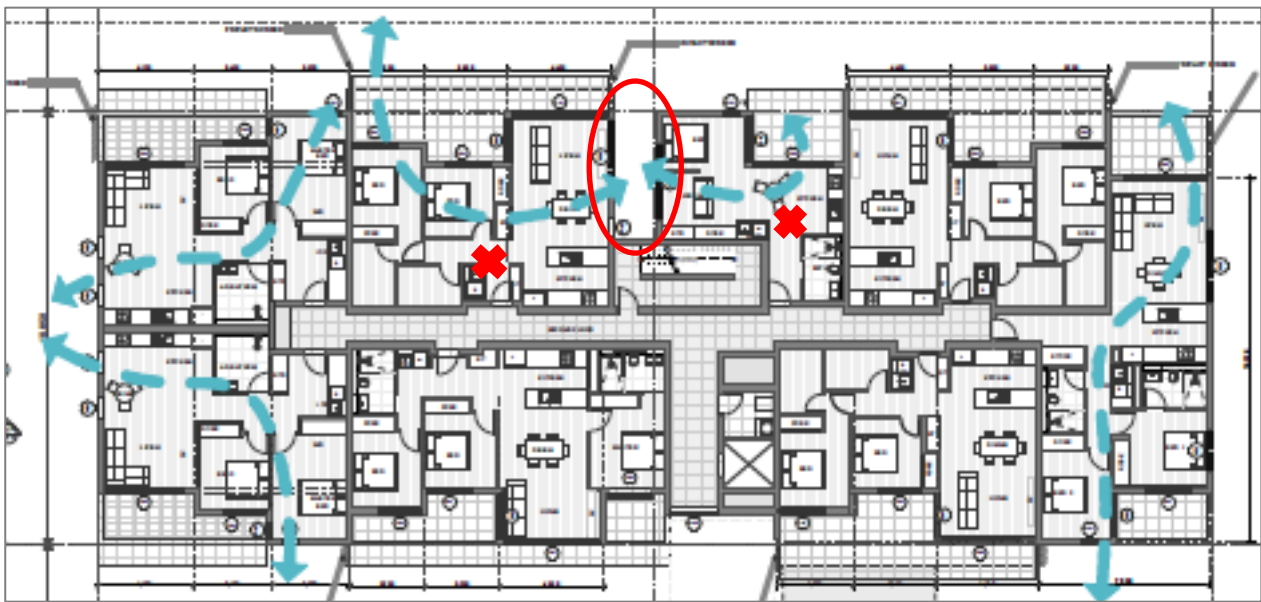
Extract of architectural drawing DA-4003 SEPP65 cross ventilation diagram, red crosses showing example of where single aspect units are counted as naturally cross ventilated, relying on small slots on the same side of the building
